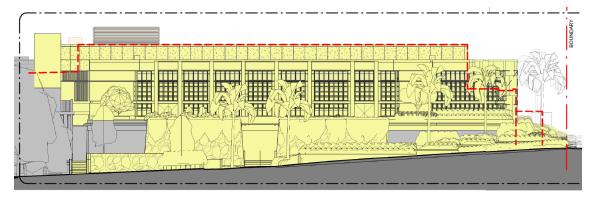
Proposed works on northern elevation (Hawkesbury Avenue) (Source: Altis Architecture)
